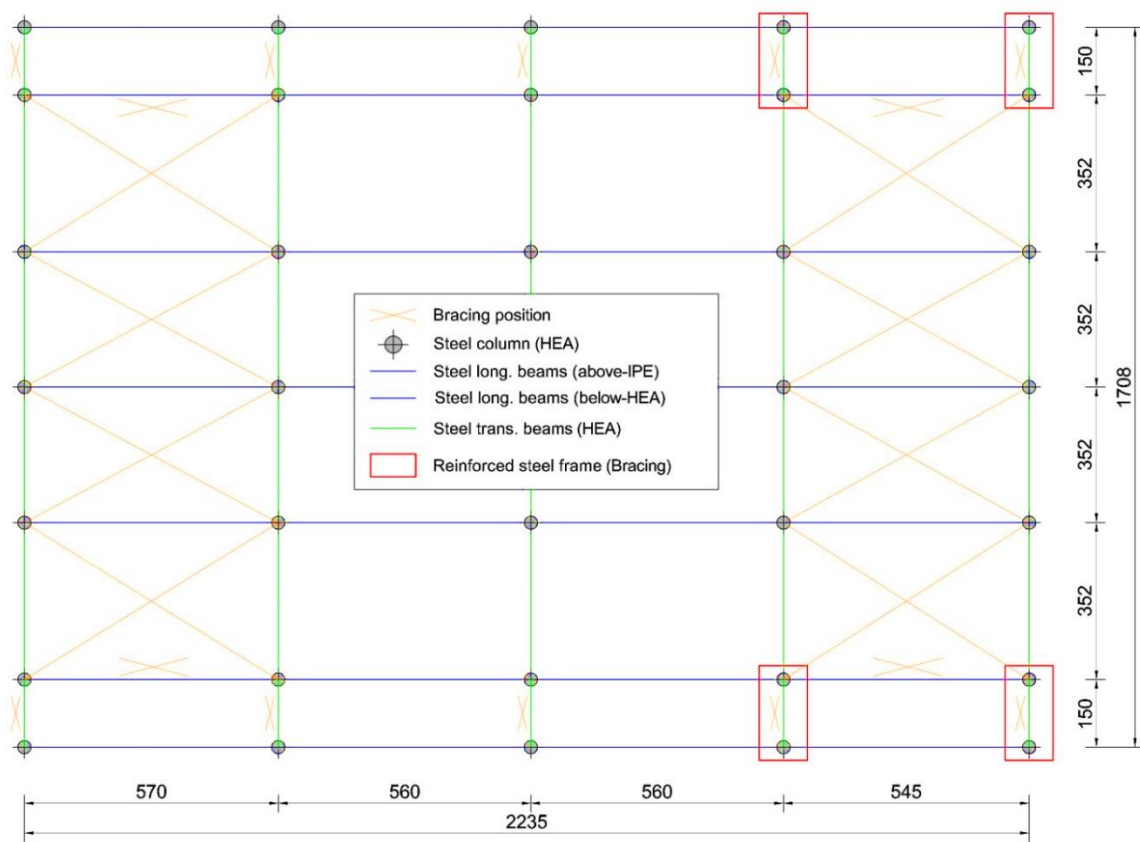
Planimetric scheme of the roof-extension, with Vierendeel beams, identifying the profiles used and indicating the positions of the bracing (cm as units)
